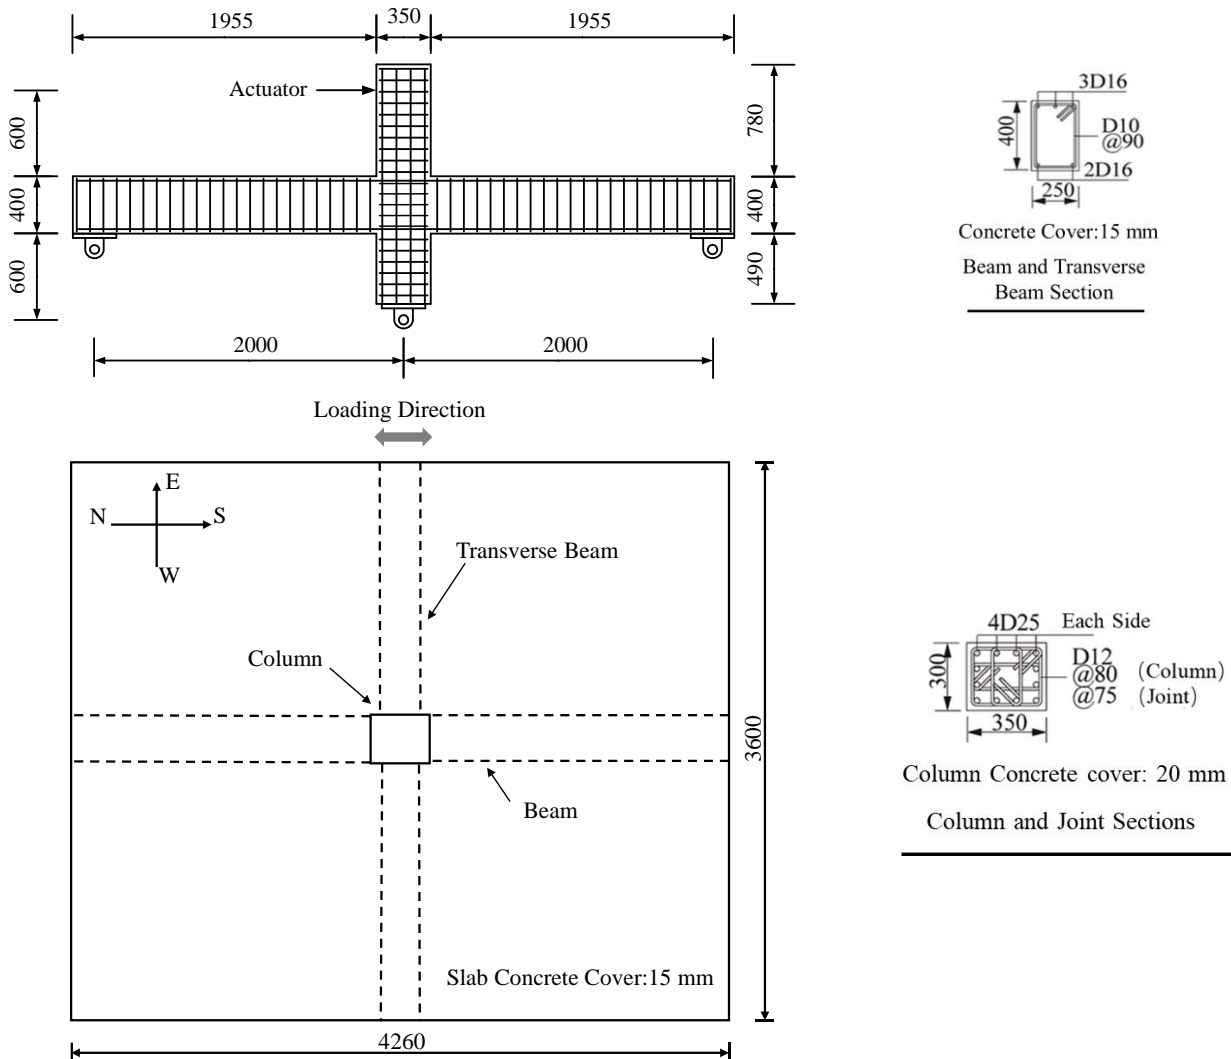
Dimensions (in millimeters) and reinforcing details of Specimen 3SA.
